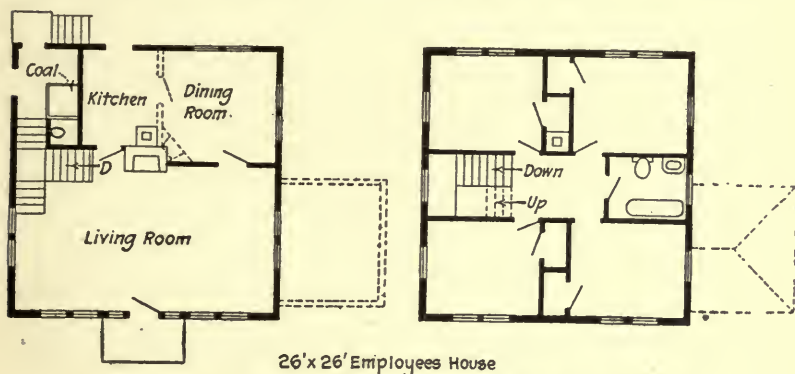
SUGGESTED PLANS OF A WORKMAN'S HOUSE.
